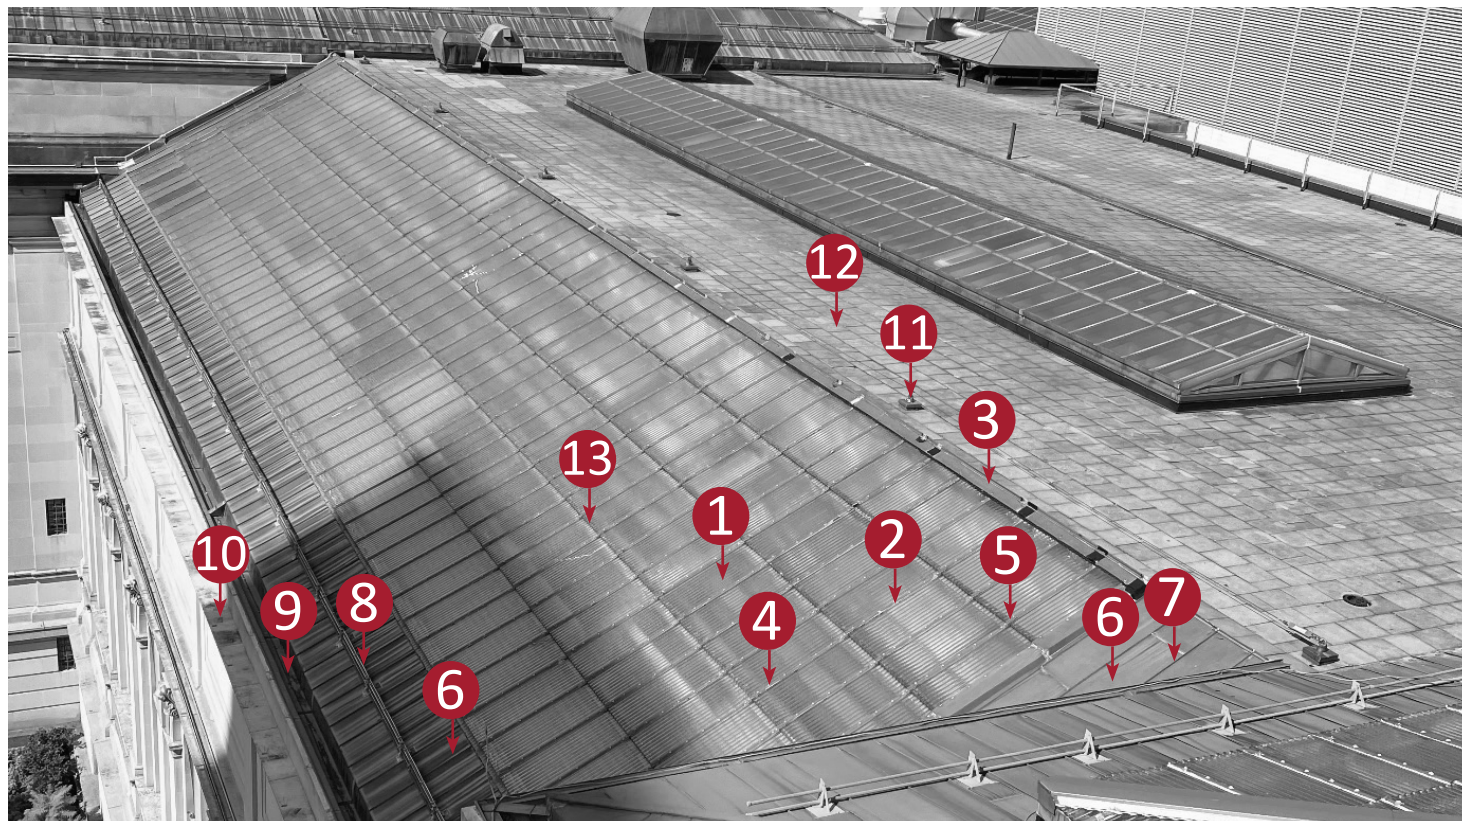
PHOTO MONTAGE WITH PROPOSED NEW OPAQUE ROOF
